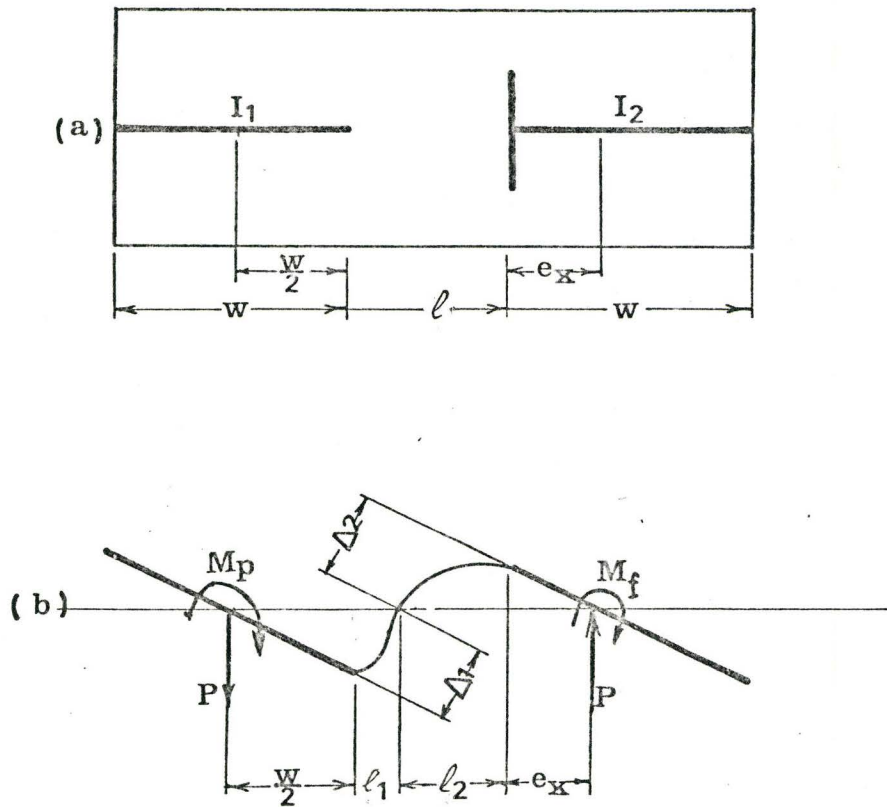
Typical Plan and Rotations of Planar Wall with T-Section Wall.
